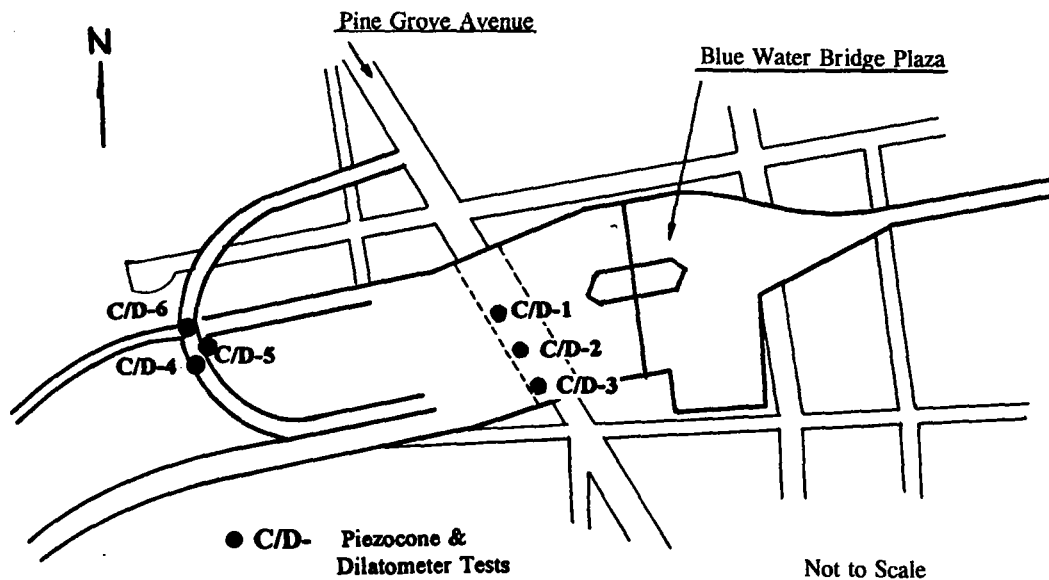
Site Plan and Field Test Locations at Port Huron, Michigan.
